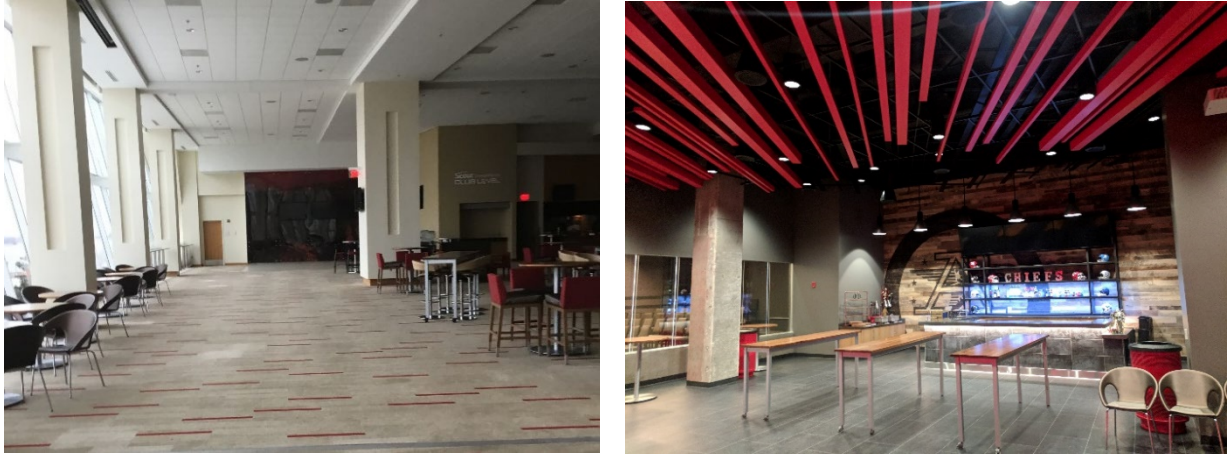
Carpet Flooring (left) & Porcelain Tile Flooring (right)
